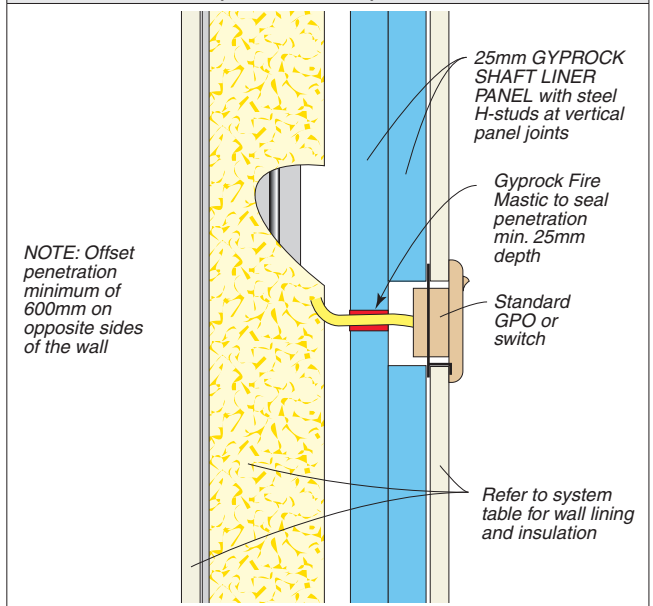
GPO/SWITCH INSTALLATION IN STUD WALL (FRL -/120/90)
